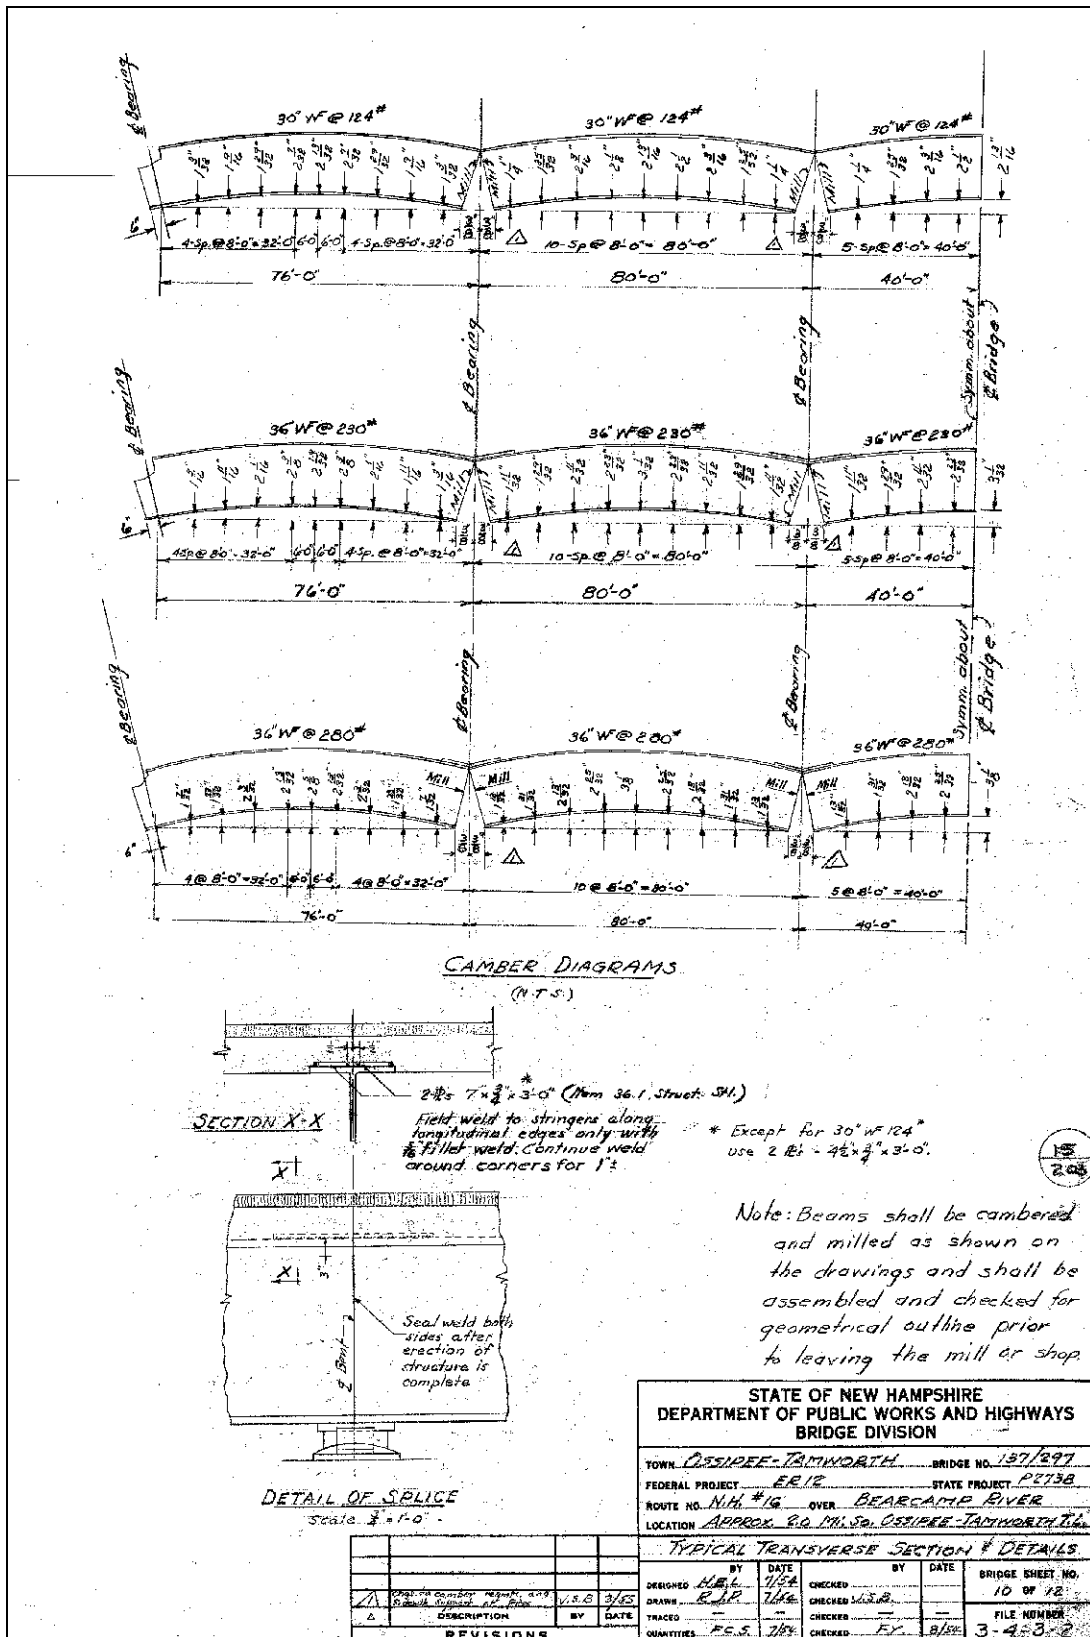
Stringer camber and splice details, part of the design that makes the stringers function structurally as both simple and continuous beams (From Sheet 10 of original drawings, NHDOT File No. 3-4-3-2).
